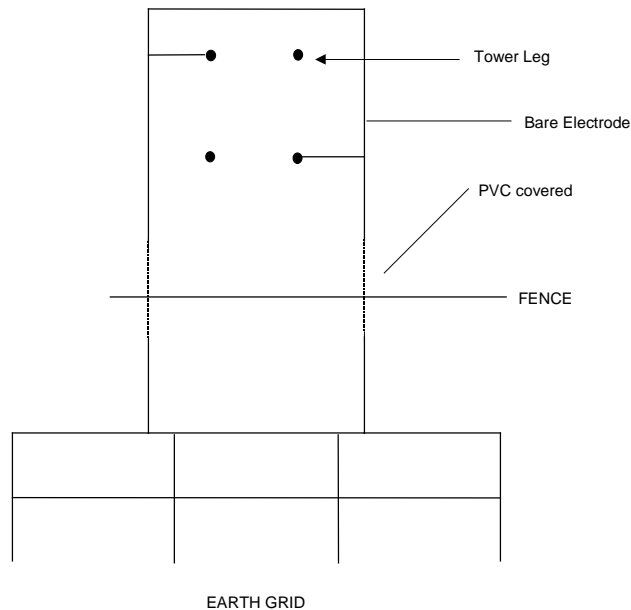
EARTH CONNECTION TO TERMINAL TOWER.
